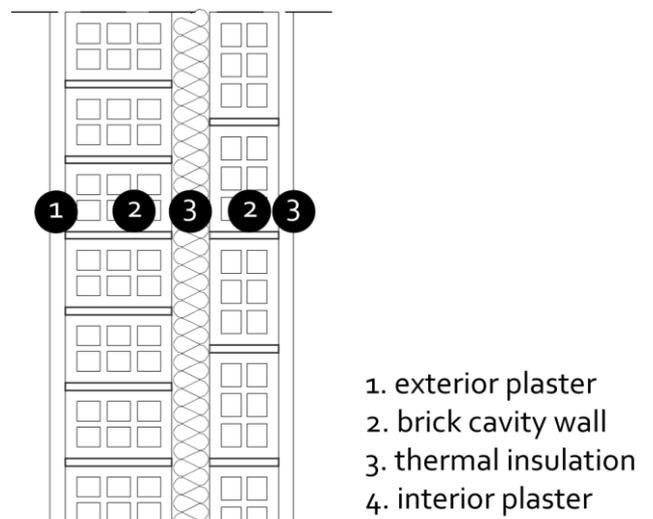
Common practice brick walls - Buildings like MF3 (161)
